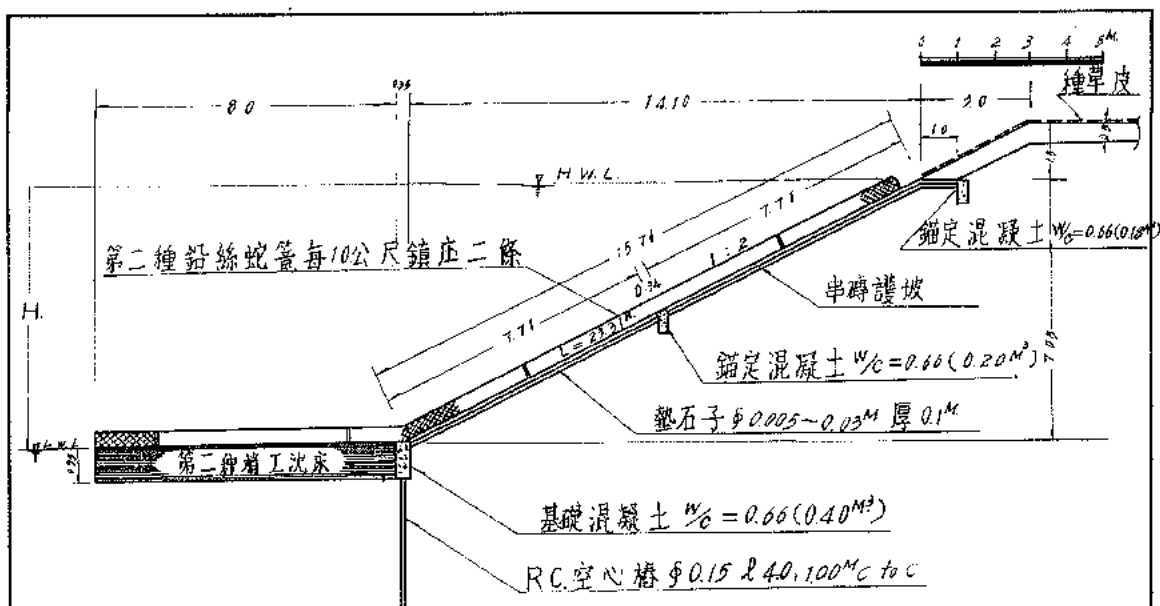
TYPICAL SECTION OF CONCRETE WALL
